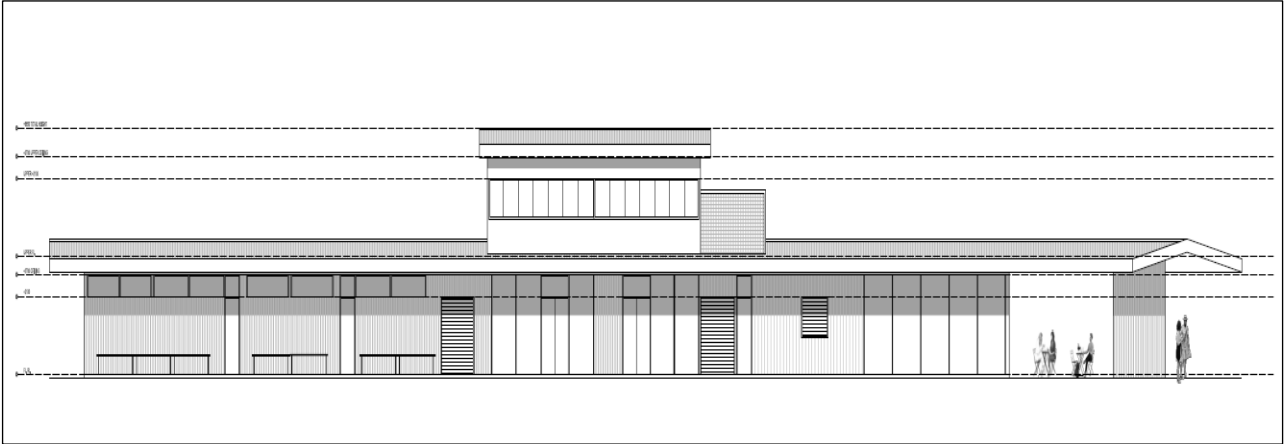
The Main Pavilion, PWA Surveying plans DA.2020.1351 amended submission
